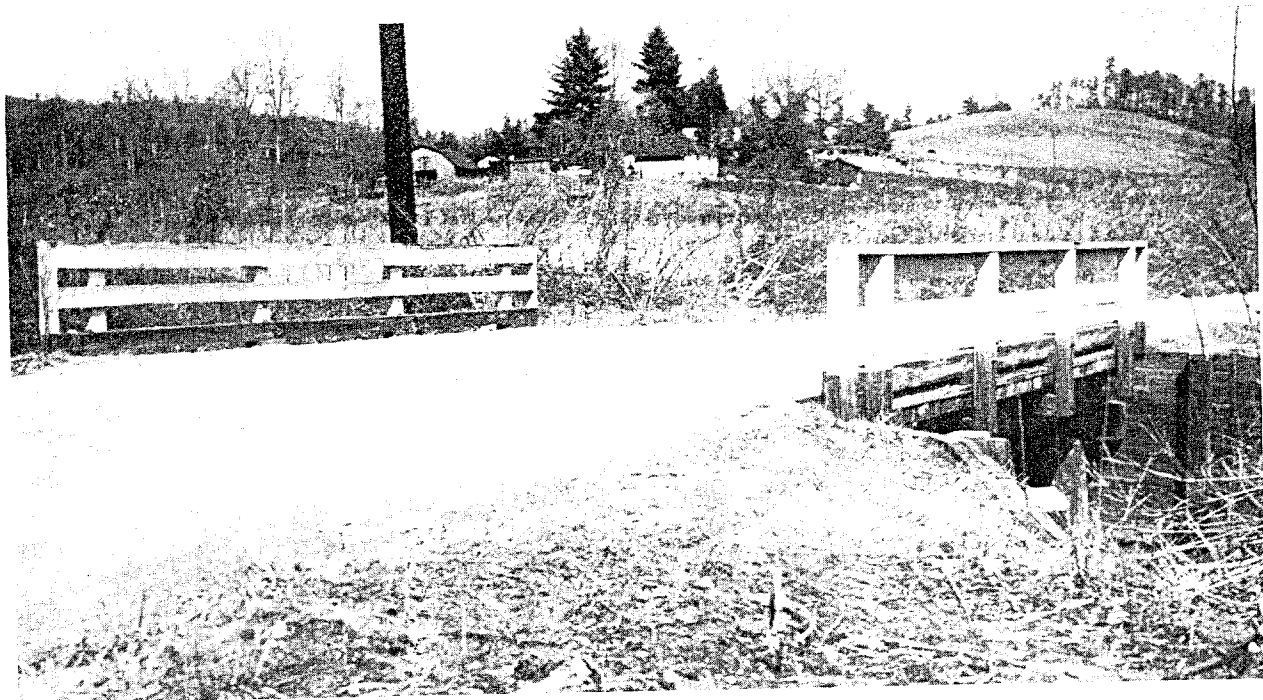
NICHOLSON CREEK ROAD BRIDGE OVER CREEK
